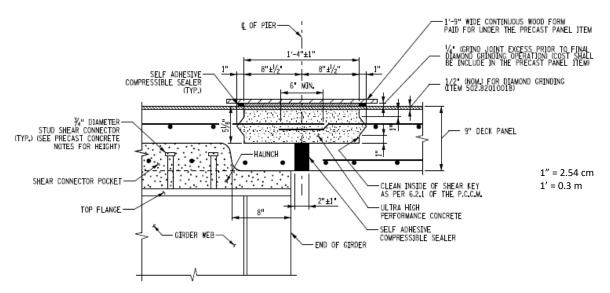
UHPC link slab detail (image courtesy of New York State DOT)
